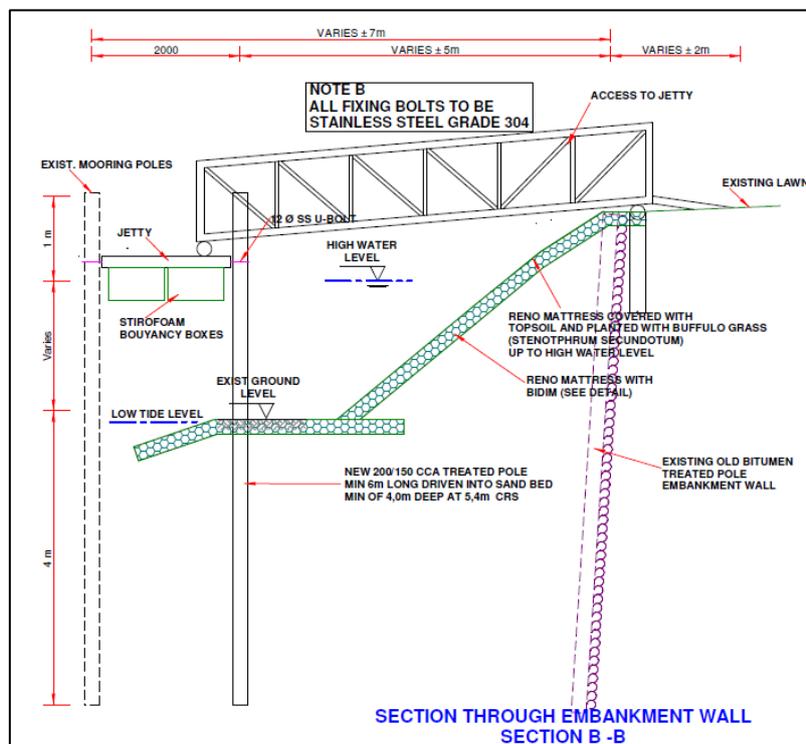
Cross section of the proposed design reno mattress embankment and associated floating jetty infrastructure.
